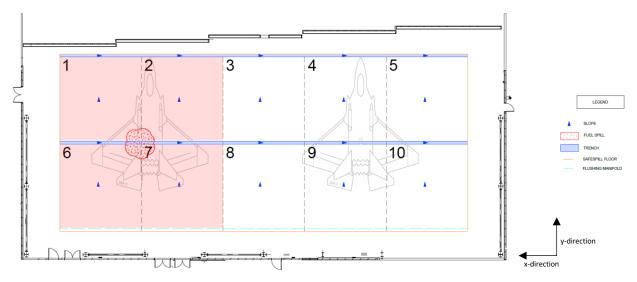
ILDFA layout drawing showing 4 zones activated by spill at intersection of 4 zones
